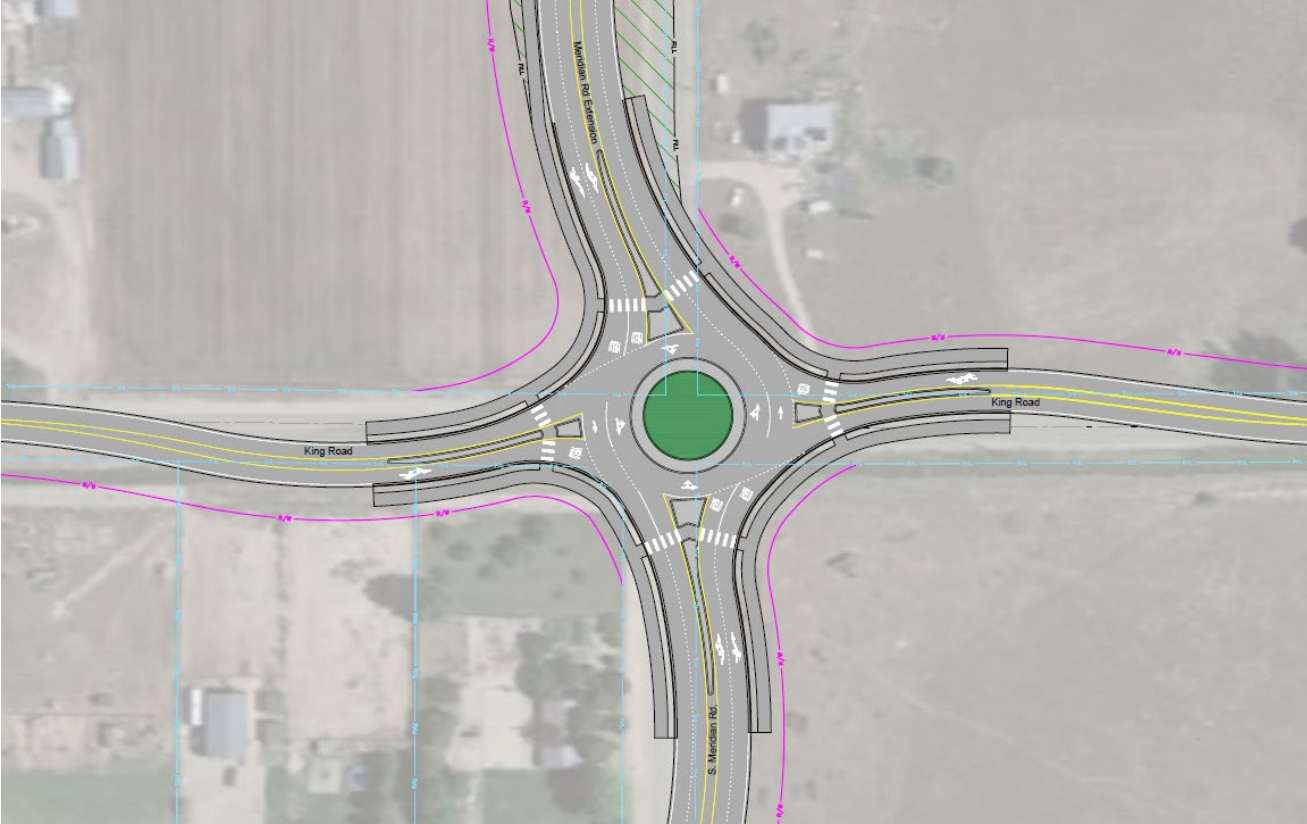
Proposed roundabout configuration at Meridian Road and King Road
